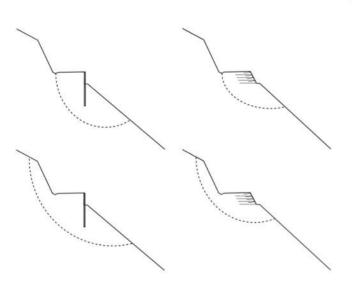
Schematic example of global failures below pile retaining walls and MSE walls
